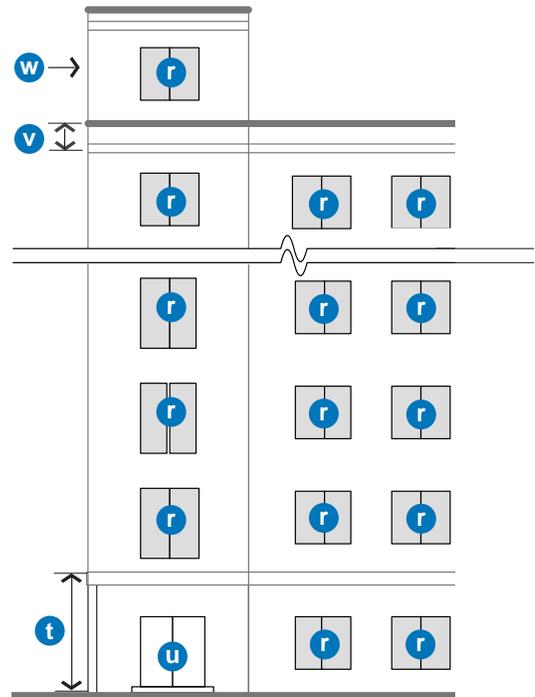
(3). General Stoop Building: Street Facade Requirements.
